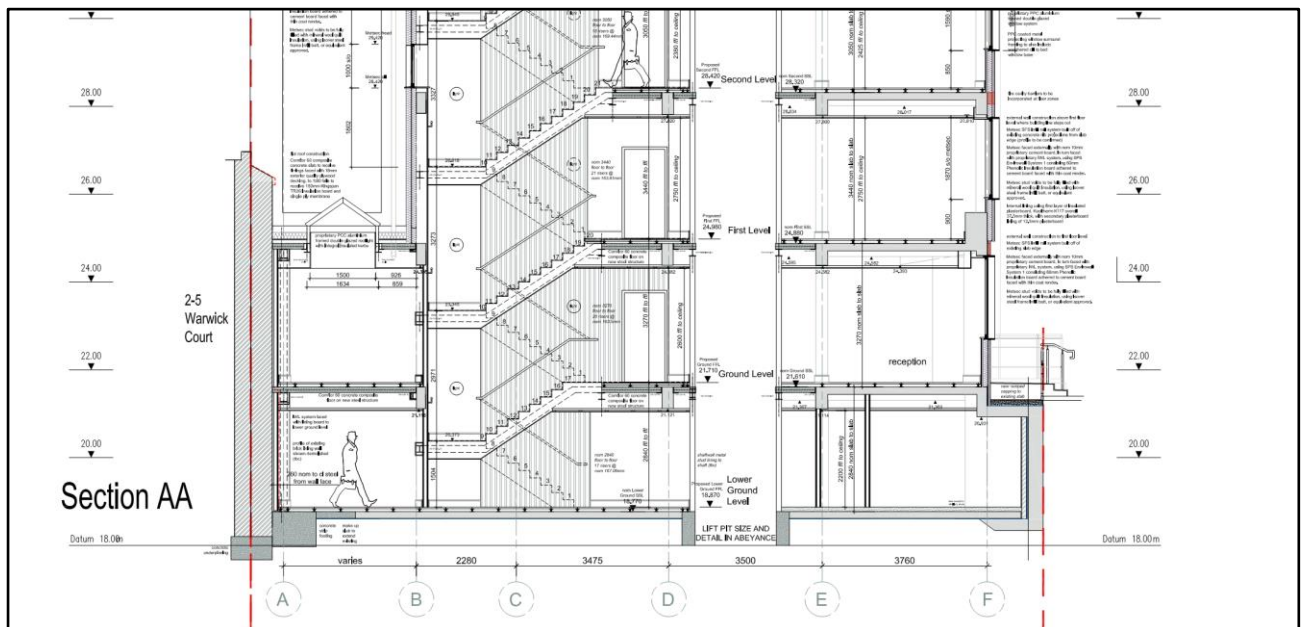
Extract from Drawing Section AA – Proposed Through Stair and Lift Core Looking Towards 8 Fulwood Place Provided By GCP Architects
